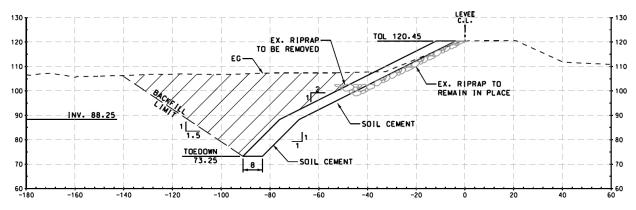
Typical Cross Section of Alternative A2 (Sta. 368+00)
